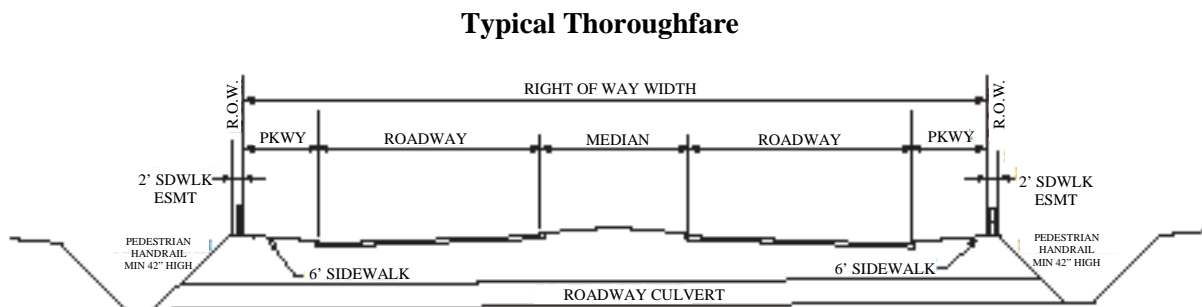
Typical Pedestrian Handrail Over Culvert
